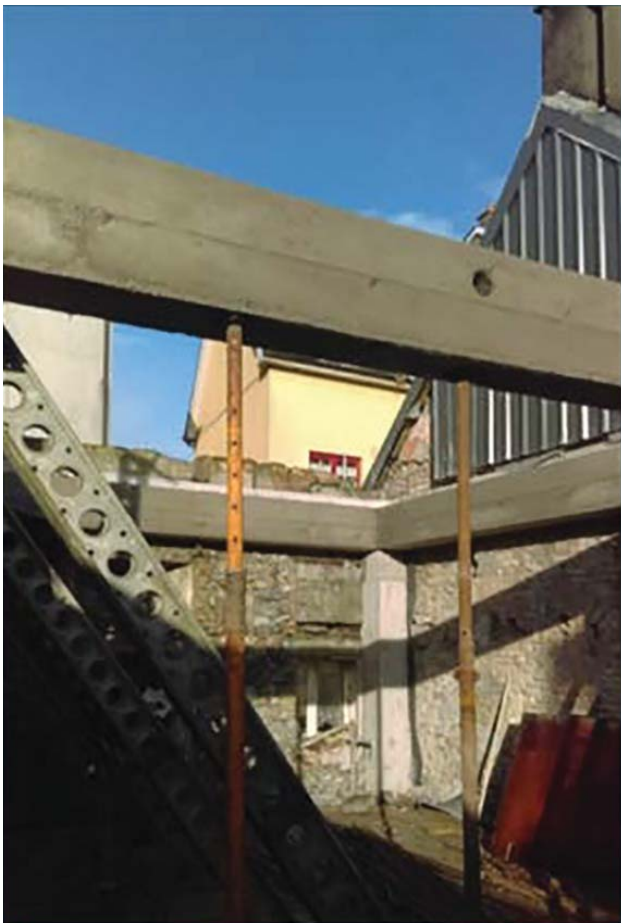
The work on the new concrete frame structure designed to carry the roof and floors in progress
